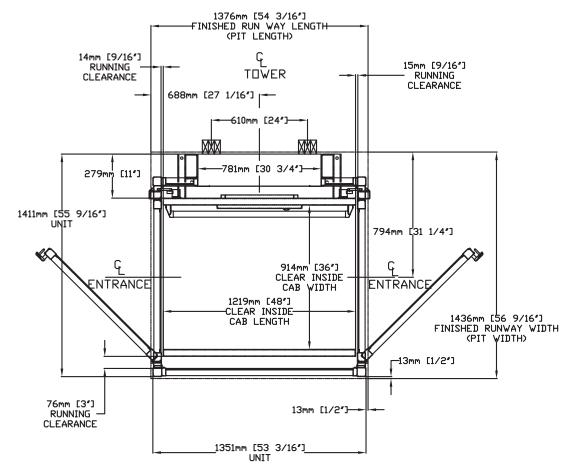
Plan View - Type 2, 36" x 54" Cab, Hoistway Application
